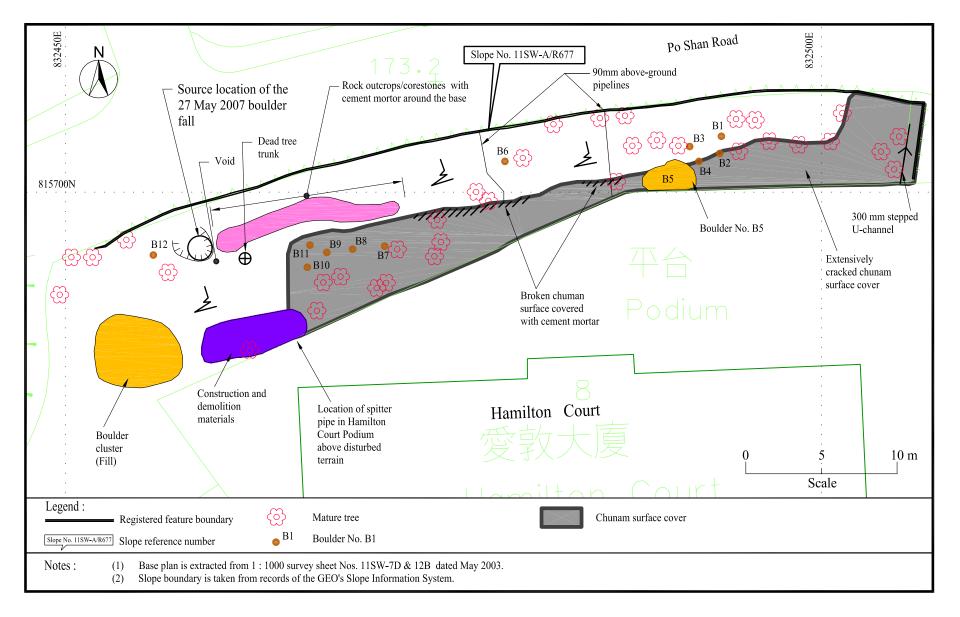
Detailed Mapping of the Sloping Ground above Retaining Wall No. 11SW-A/R677
